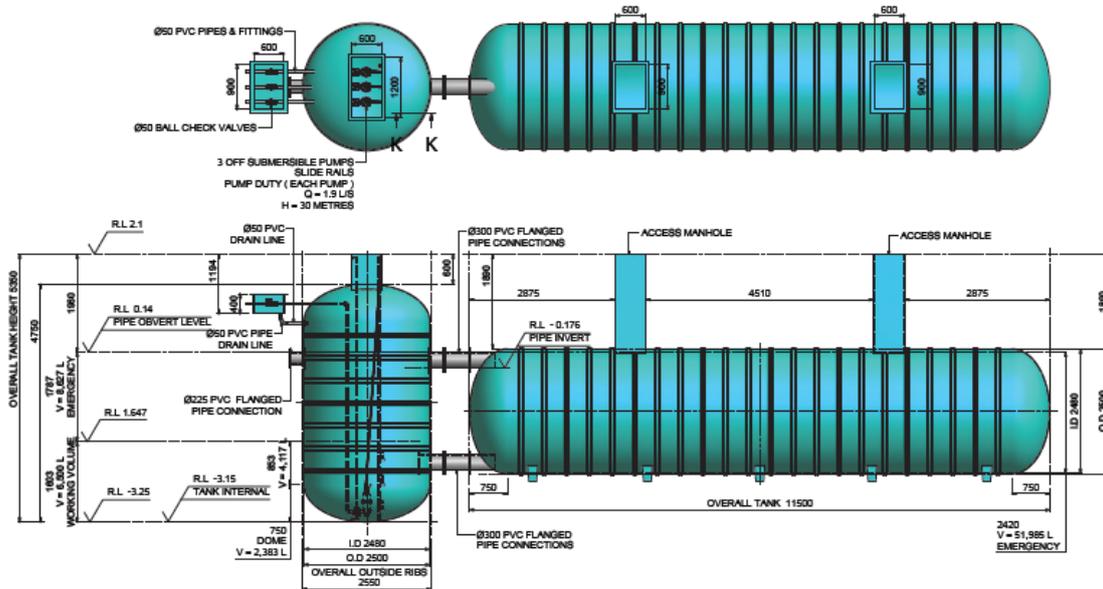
Typical Plan and Section of a submersible pump station with emergency storage tank
